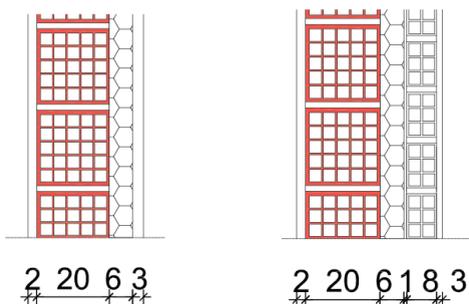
Possible interventions in the façade with hollow brick walls, by adding a layer of thermal insulation only, or a layer of thermal insulation plus a layer of external perforated bricks to improve thermal insulation of the external wall
